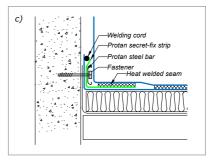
Protan roofing membrane taken approximately 100 mm up on the parapet. Secret strip or pocket welded onto the parapet skirt, fixed mechanically to the parapet with a bar. Remember the welding cord between the roofing membrane and secret strip.
